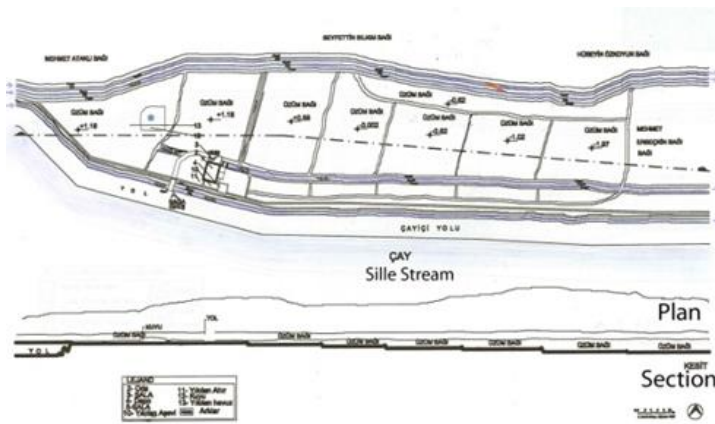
A Sille Orchard Plan (Yanartaş Orchard) (Author, 2001)
